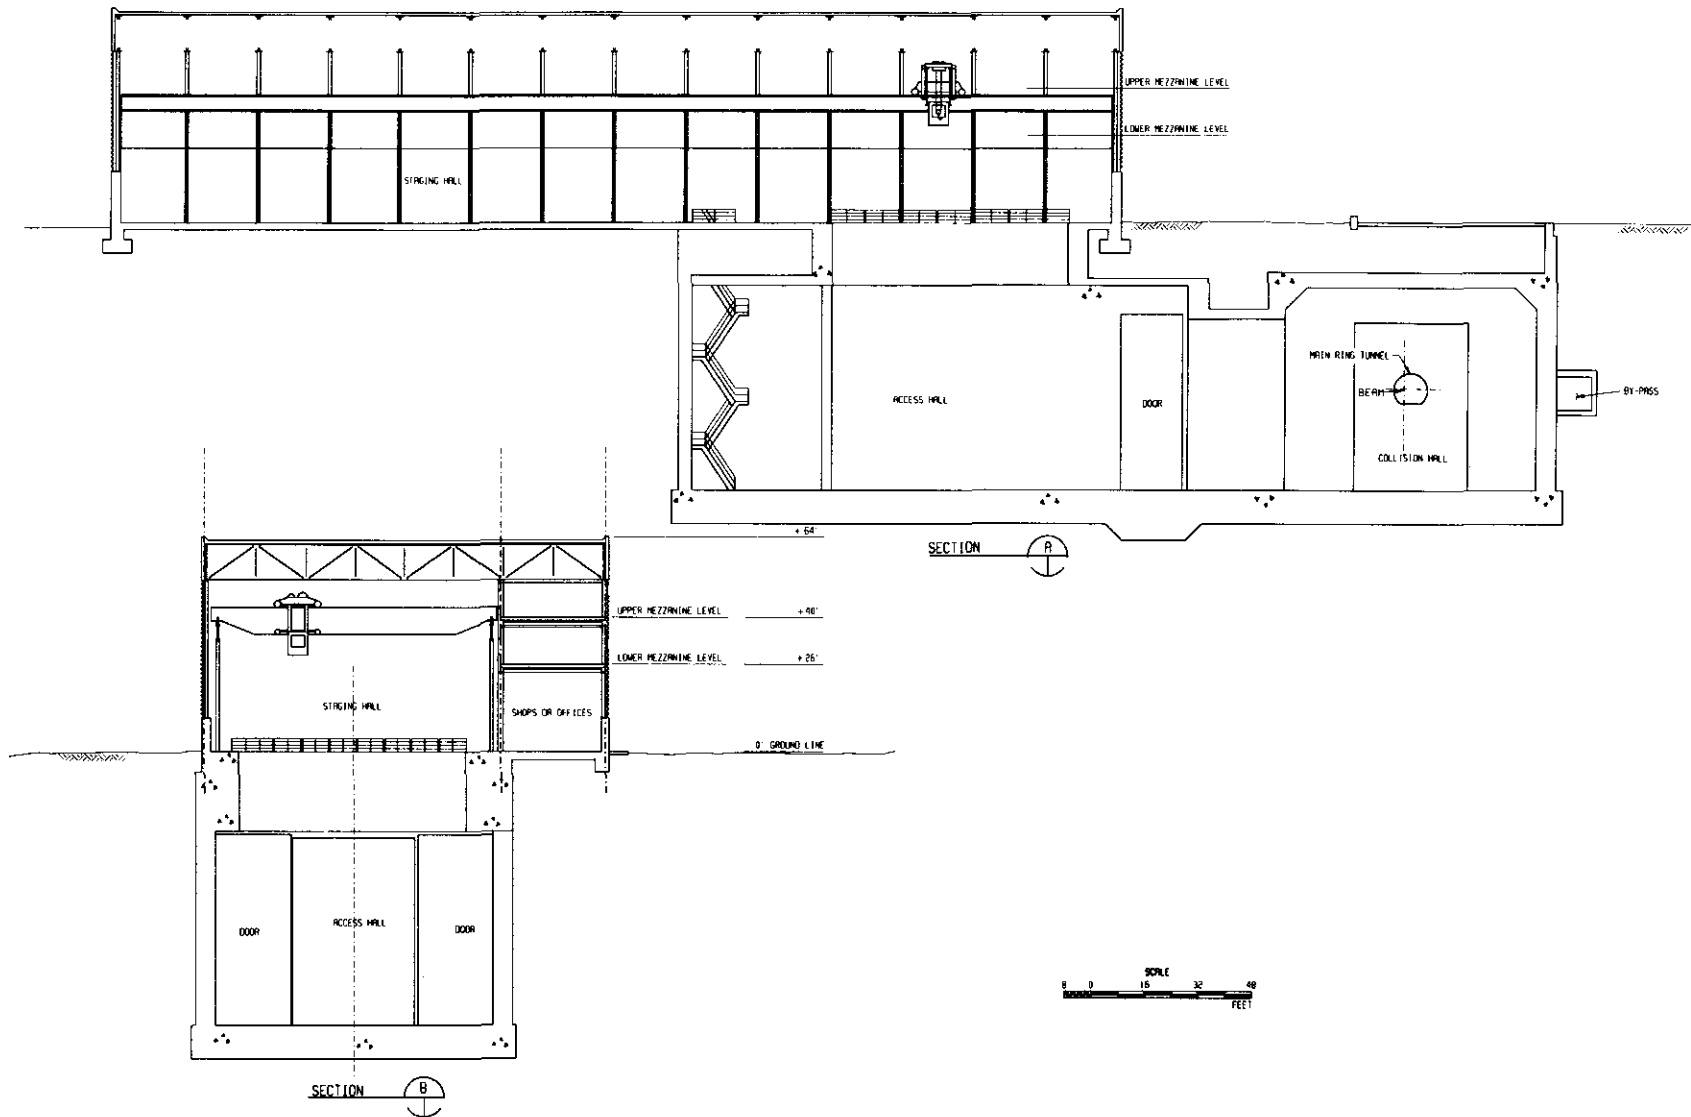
Cross Section View of Type A Staging Building showing building elements, high-bay area and assembly area; Type B Halls are identical.
